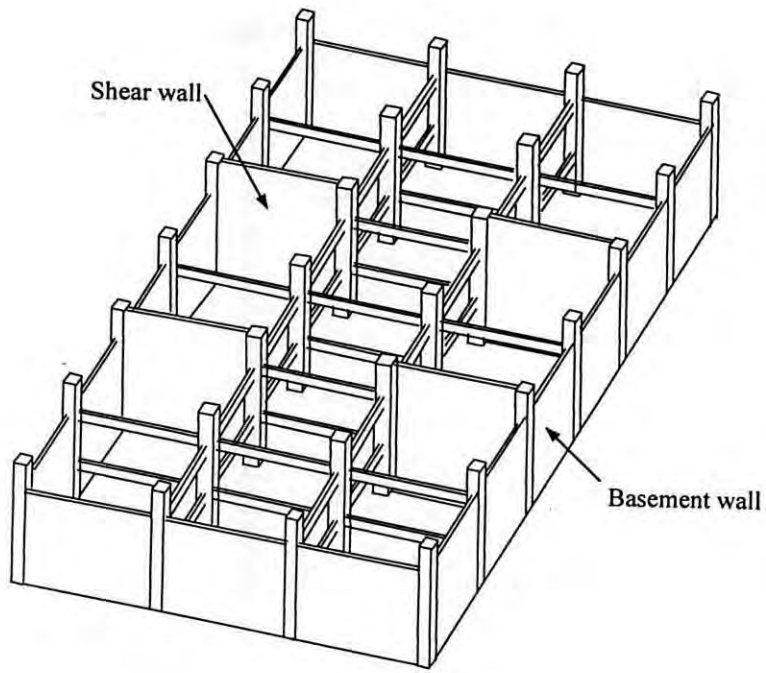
Partial View of the Type-4 (Frame + Shear Wall + Basement Wall).
